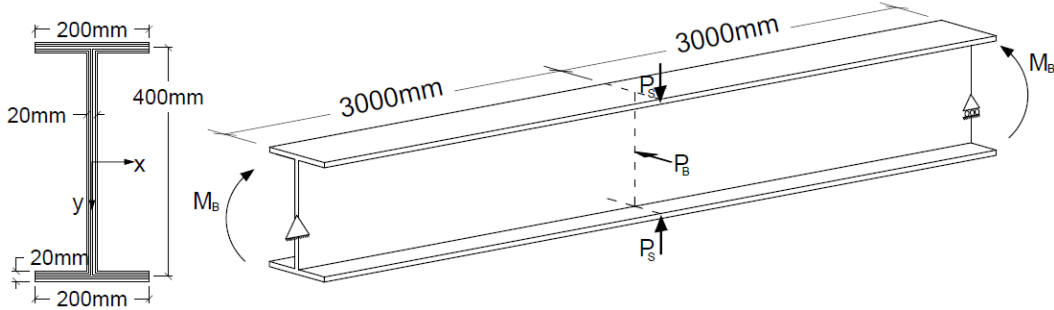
Dimensions, loading and the boundary conditions of the I-section beam
